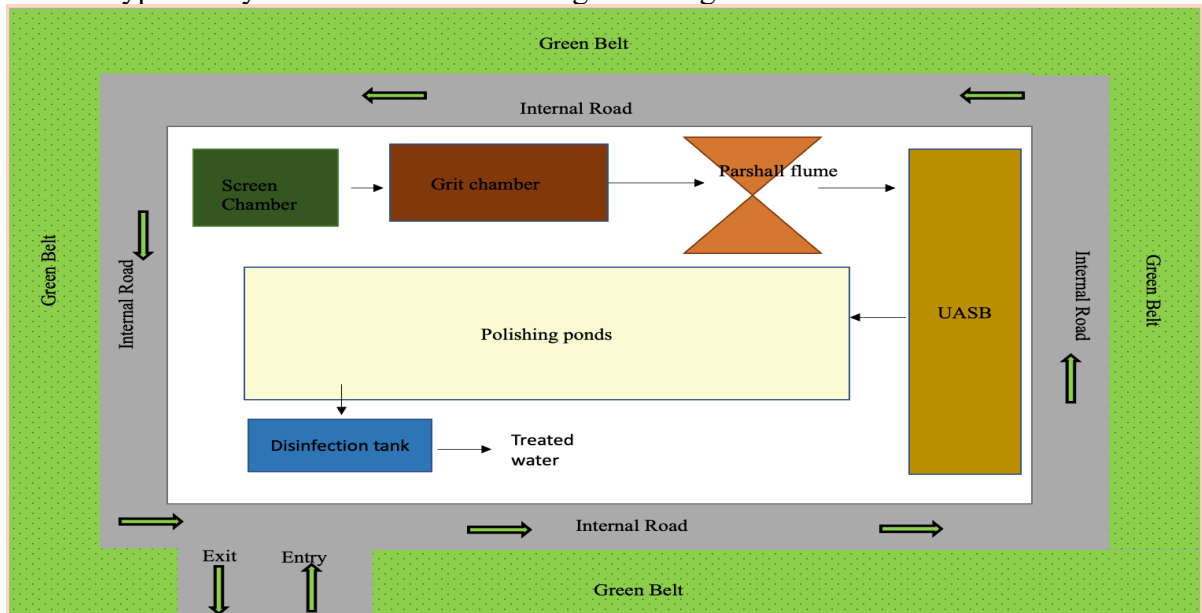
Typical Design Layout for UASB+ Polishing ponds
